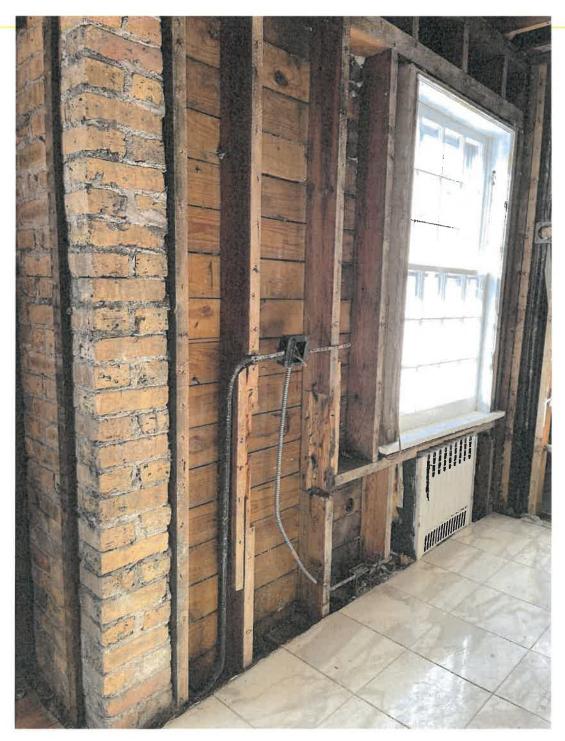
North Wing (Second Floor) – Balloon framing at west wall. Framing hacked out and spliced. No header at window opening. Indication of moisture penetration at masonry.
